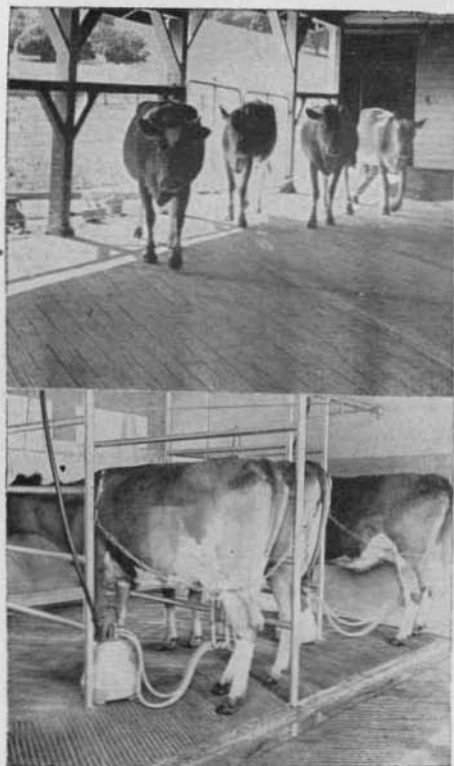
Corrugated floors for dairy stables. (Plan .72012-1)
